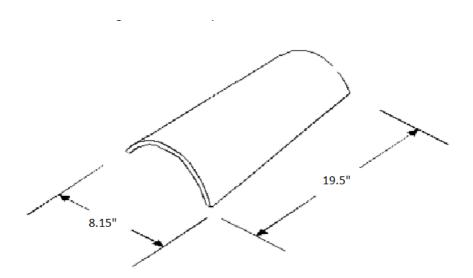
Barrel Clay Roof Tile Profile and Dimensions
